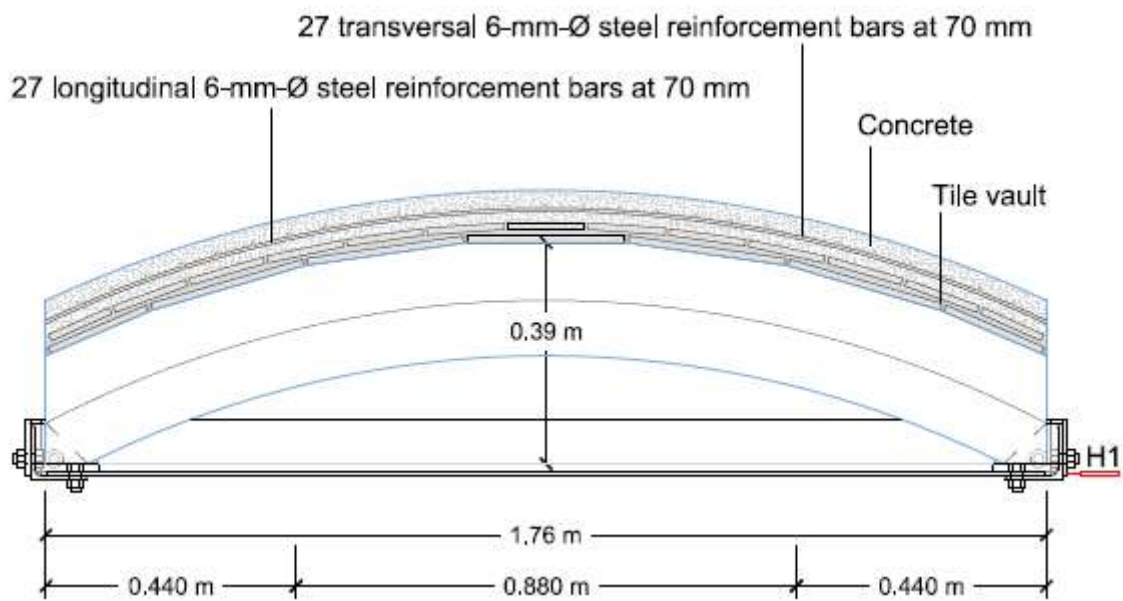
Composite sail vault prototype cross section geometry (David Lopez)
